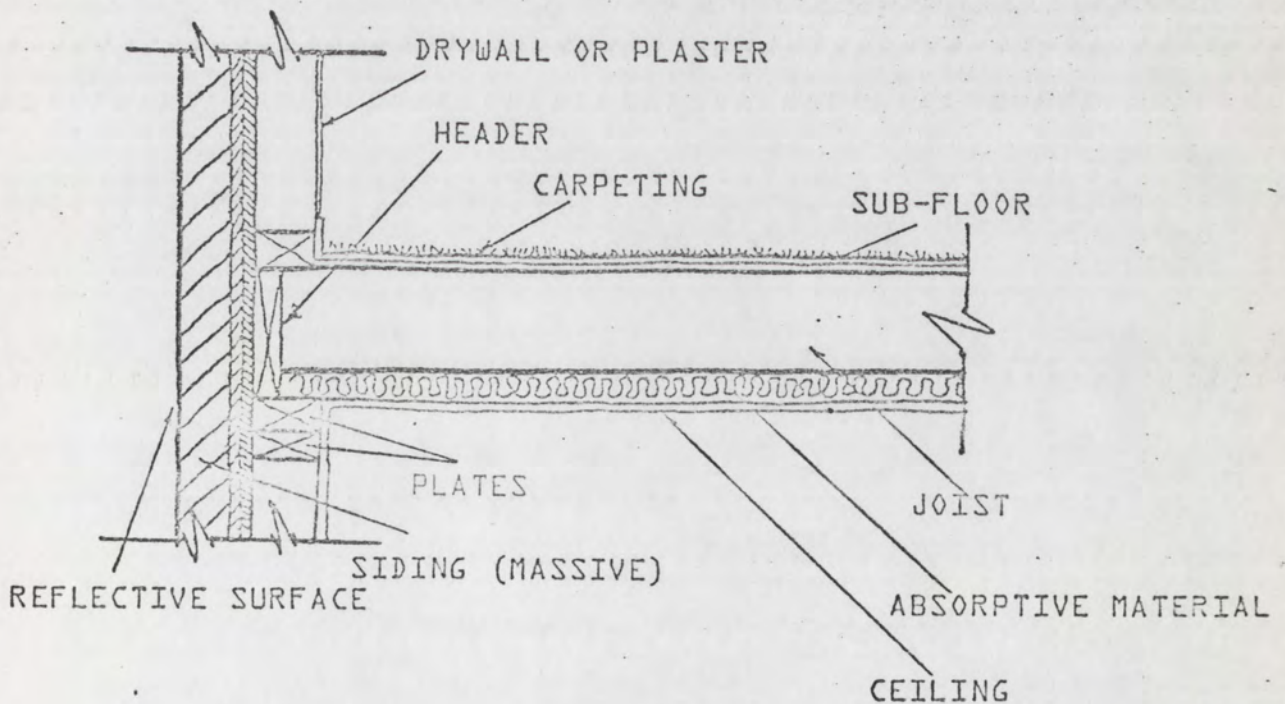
Added Space Treatment - Attic: Extra Space
